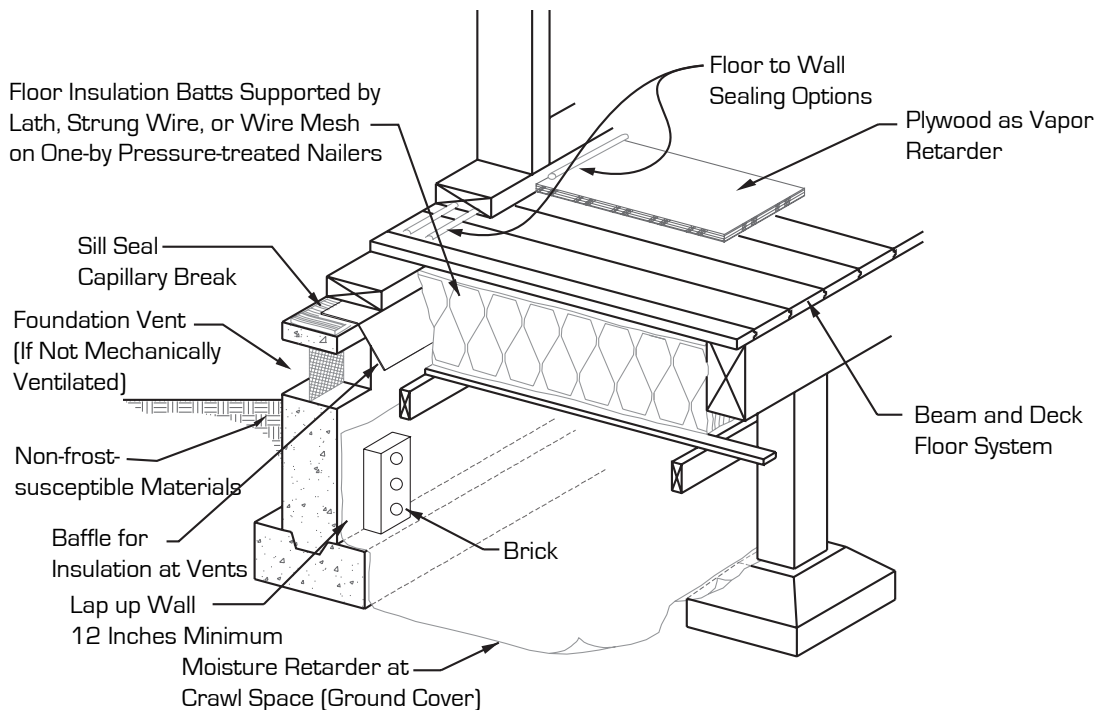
Sealing a post and beam floor with a decking subfloor
